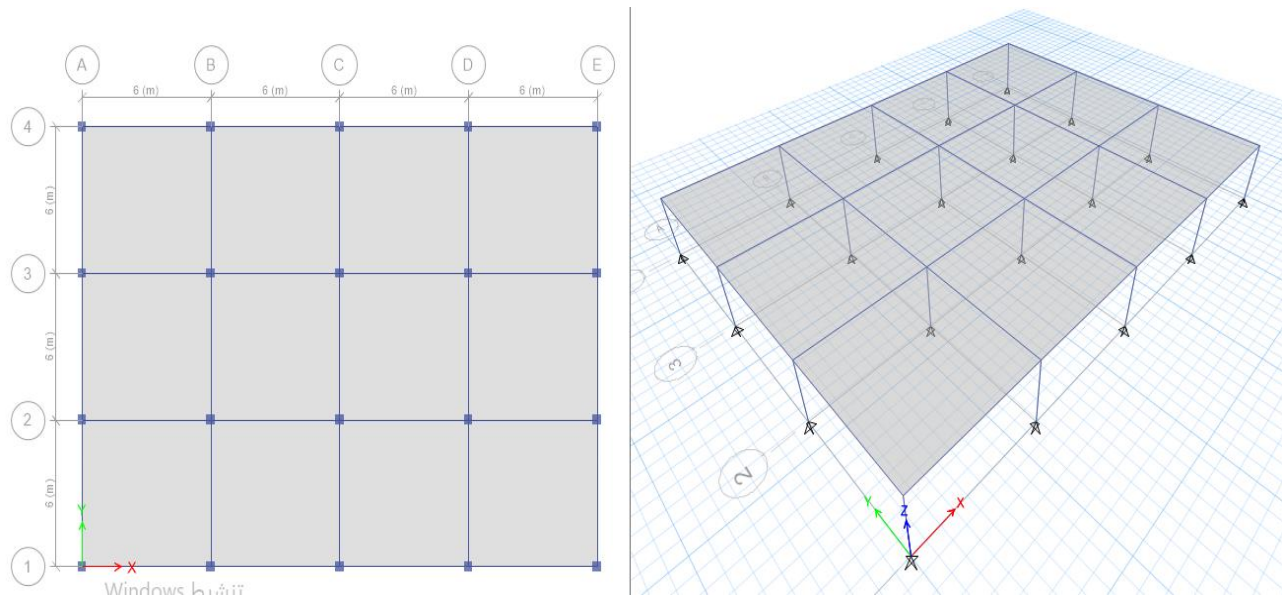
The Dimension and The Layout of the One - Story Structure Building (Frames).
